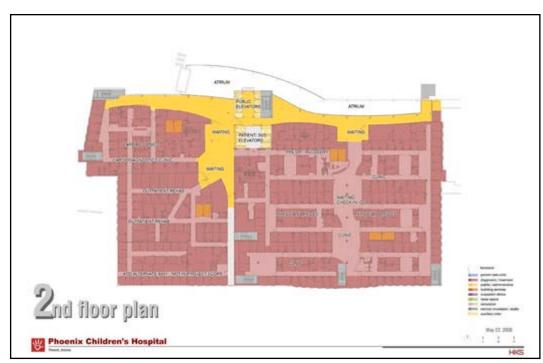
18 Second Floor Plan, Phoenix Children's Hospital
